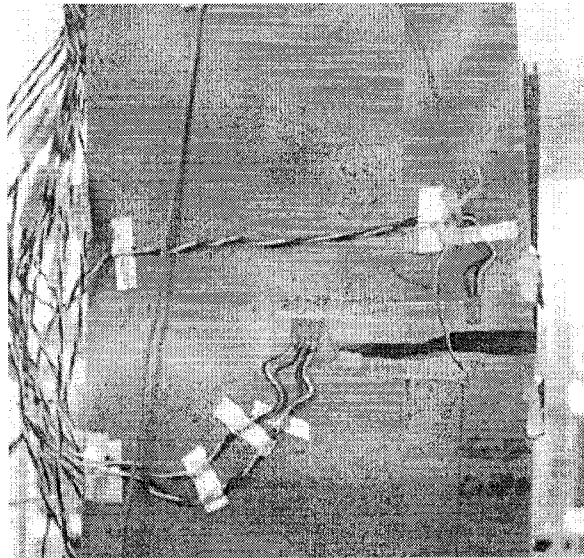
Failure of typical specimen (Roach and Rackow, 2005)
